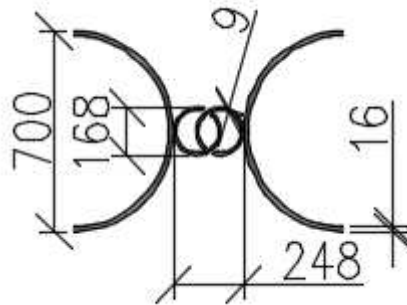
Interlocking Pipe Pile Wall 700/16 mm
